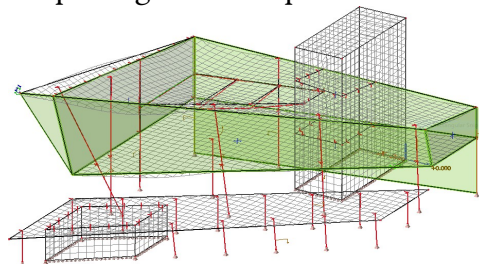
Example of complete finite element model with masonry walls, which has concrete slabs, steel beams connecting to the walls model from SCIA Engineer
